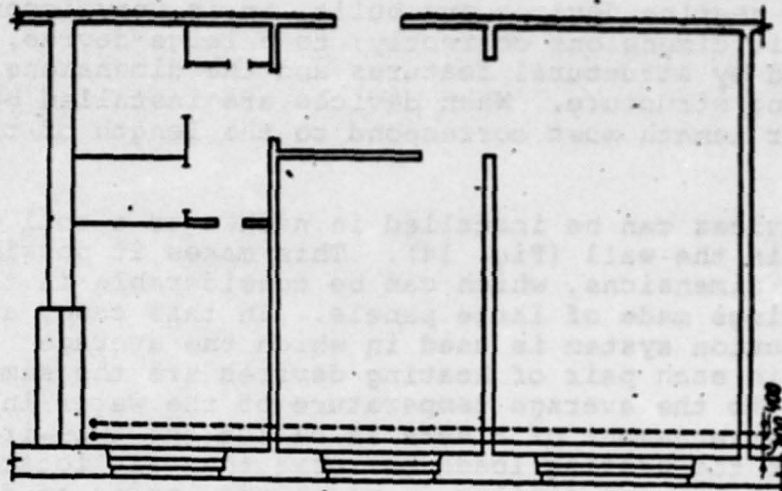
Installation of pipes for a contoured ceiling-floor water heating system.
